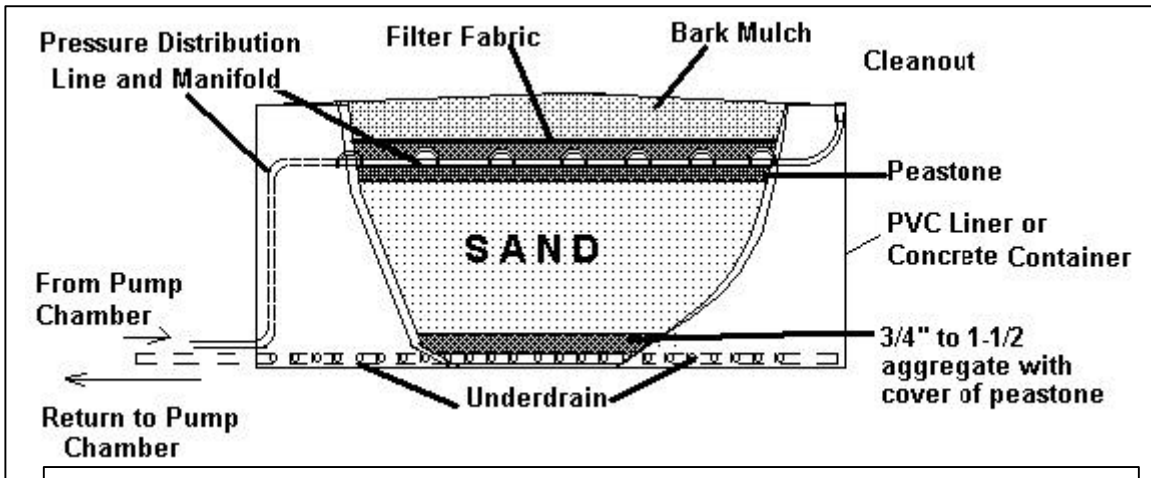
(ABOVE) Schemata of a RSF with no exposed sand surface. The final grade may be at or above existing and surrounding grade. If above grade, the containing liner is supported by a concrete or timber wall.
